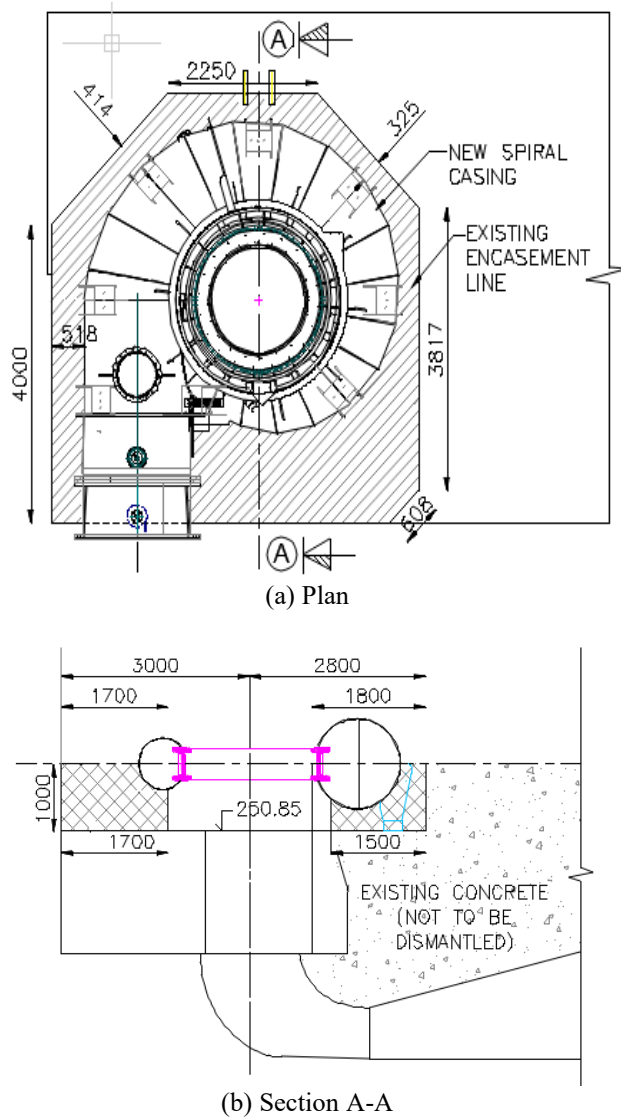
Proposed second stage concrete embedment details of spiral casing.
